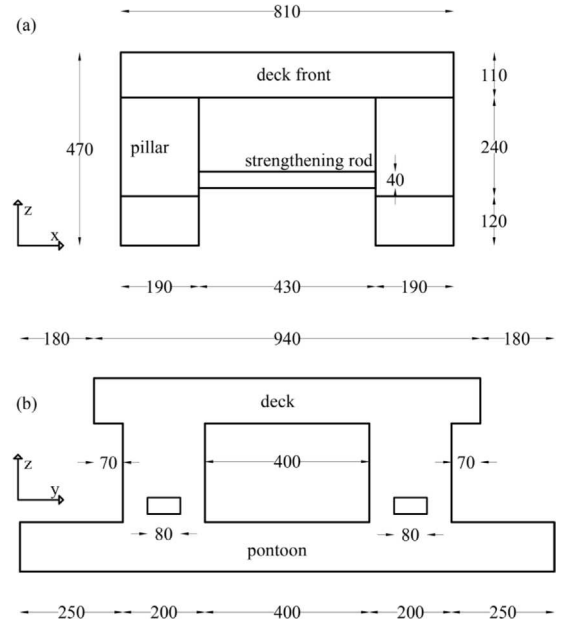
Floating structure dimensions (mm). (a) Front view. (b) Side view.
